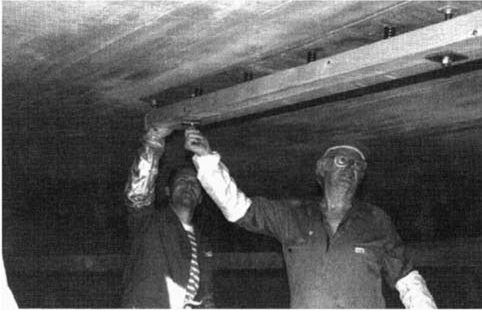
Strengthening of a concrete bridge with steel plates—carried out in Sweden during the mid-1990s
